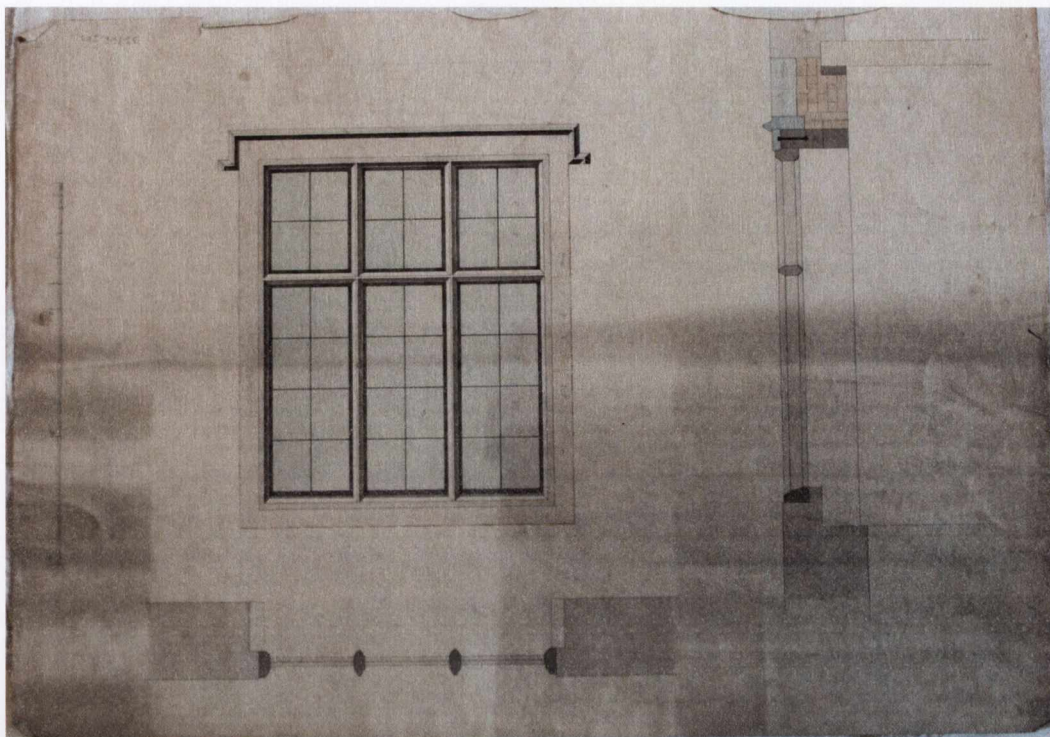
Charleville Castle, working drawing, plan, elevation and section of a square-headed window with hood moulding, Francis Johnston [1801], IAA, RIAI Murray Collection, 92/46.201, courtesy of the Irish Architectural Archive.
